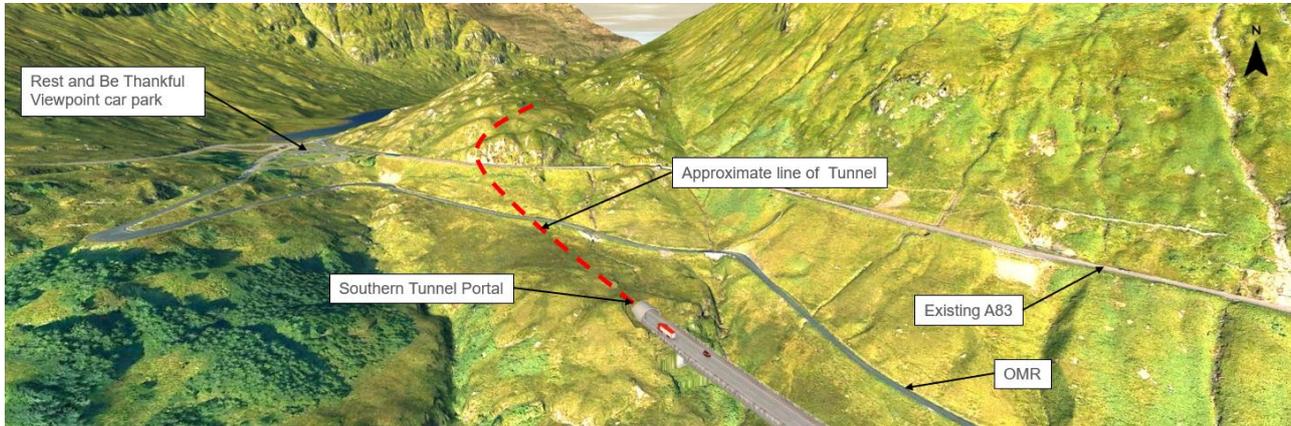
Visualisation of the southern entrance to the Purple Option Tunnel, looking north towards the Rest and Be Thankful Viewpoint car park and Loch Restil
